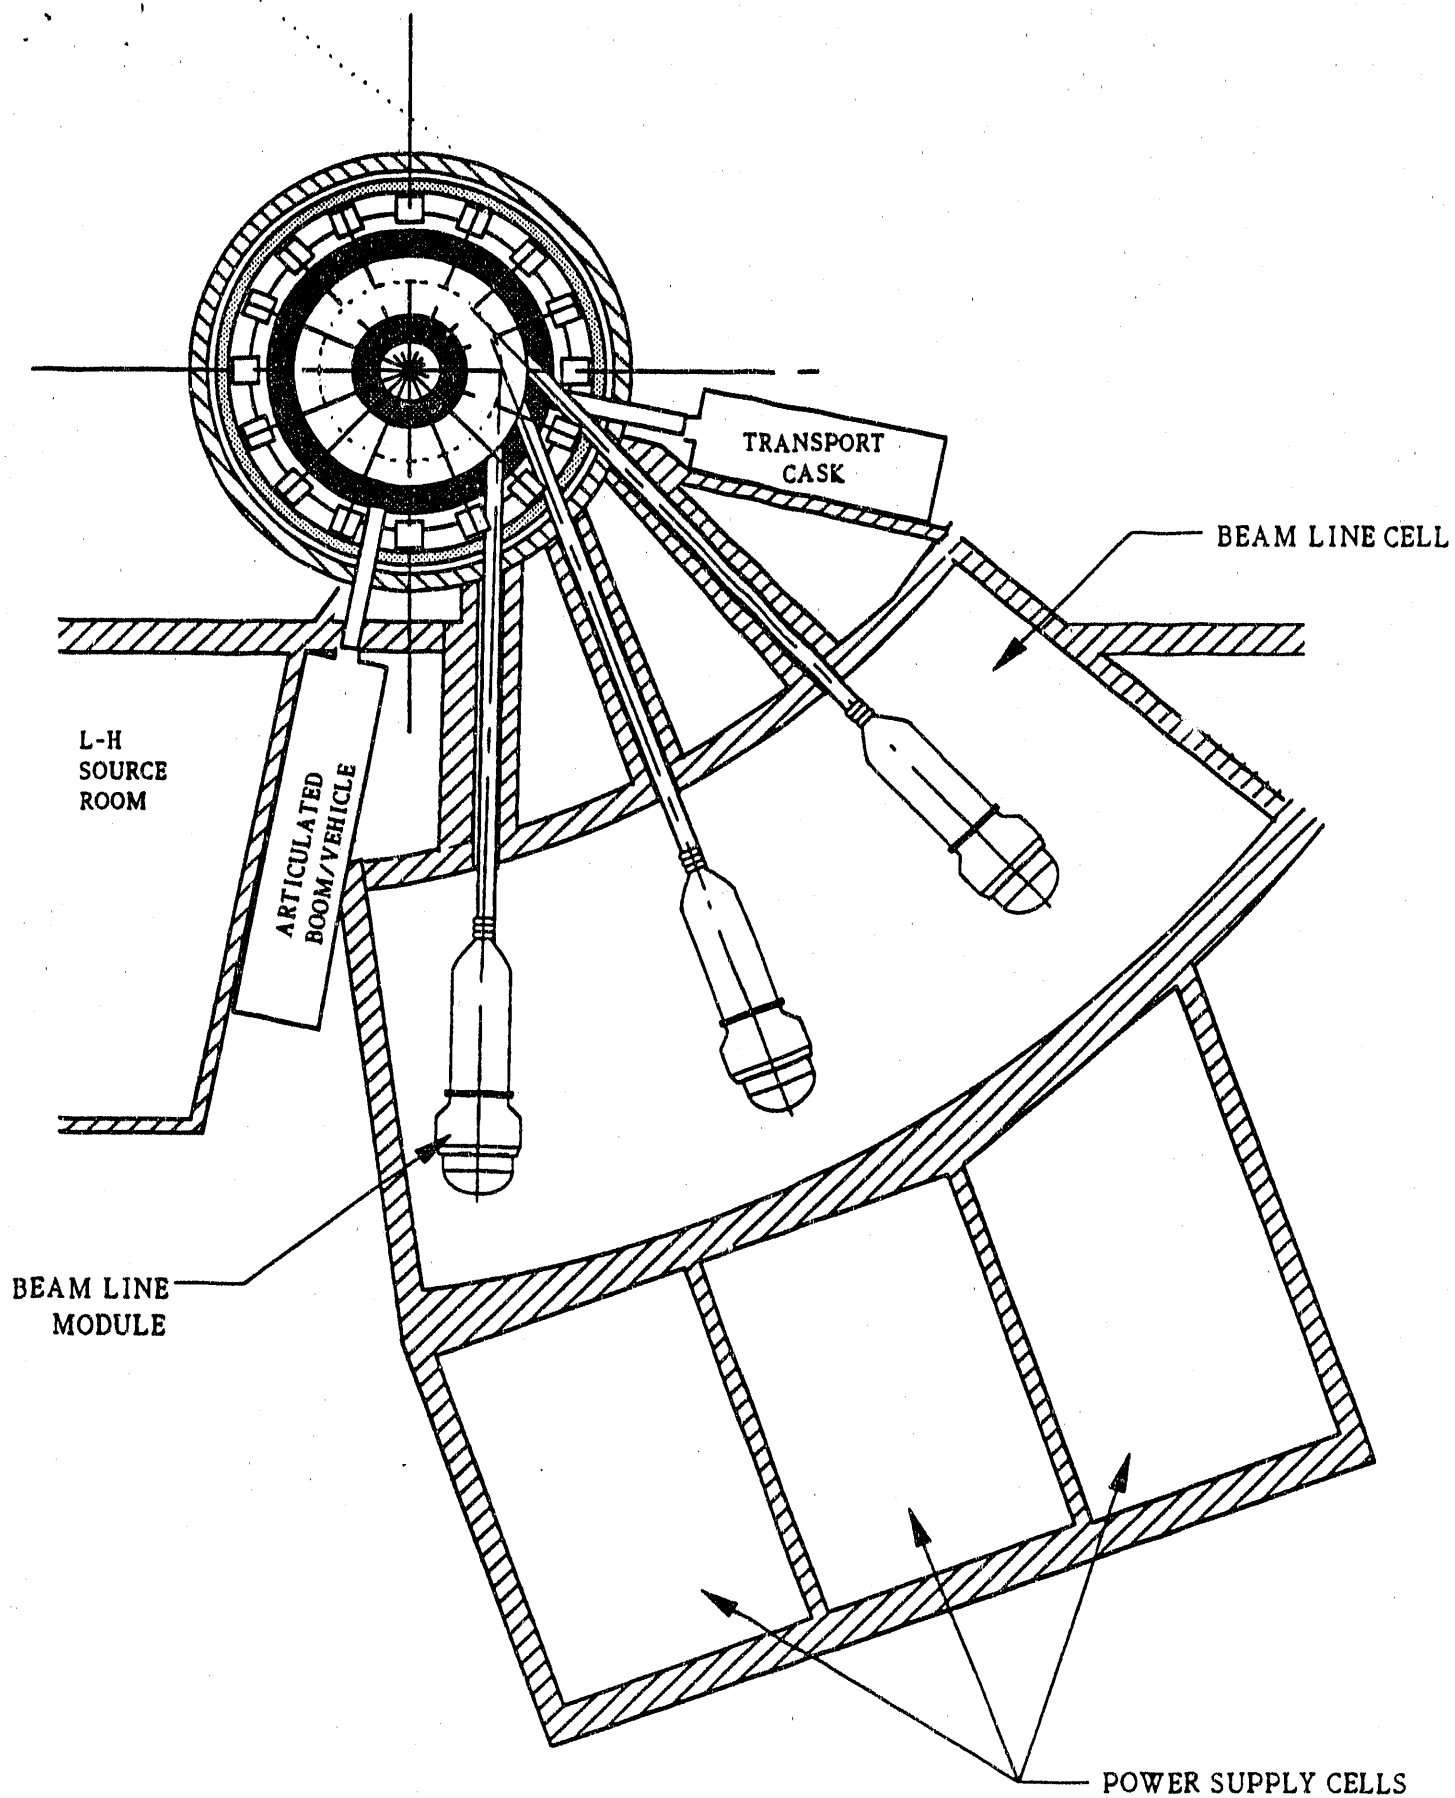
Plan view of the Neutral Beam Line Arrangement for ITER
